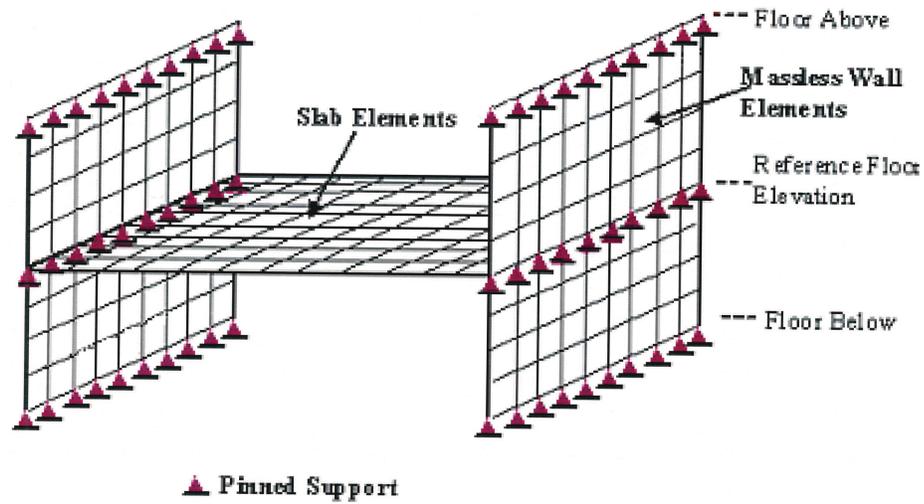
2 Floor Slab Model Boundary Conditions
